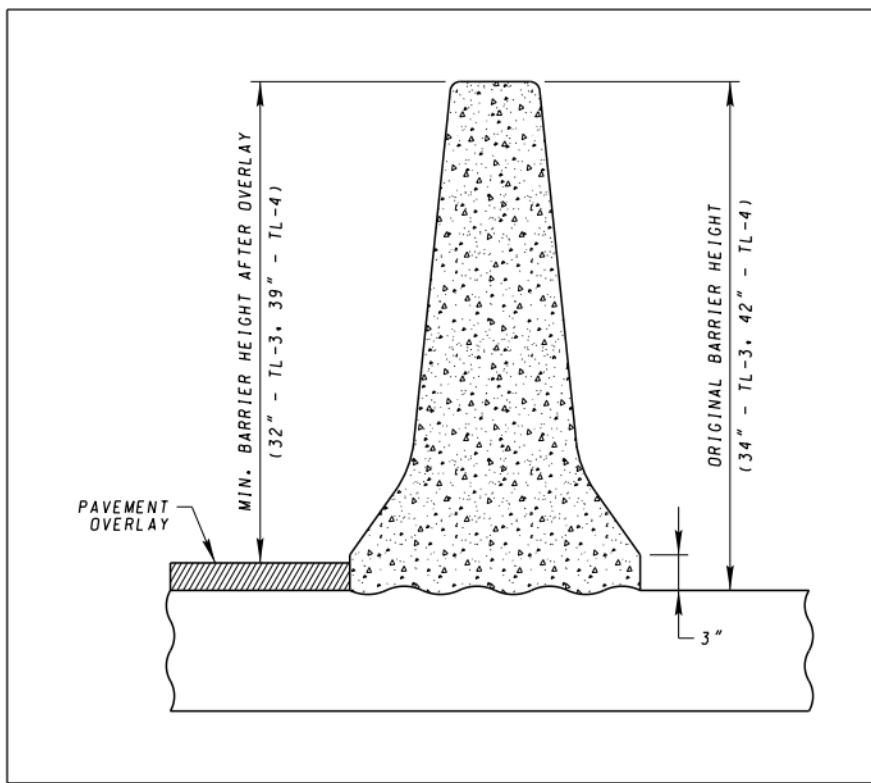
Pavement Resurfacing Considerations for Concrete Barrier
